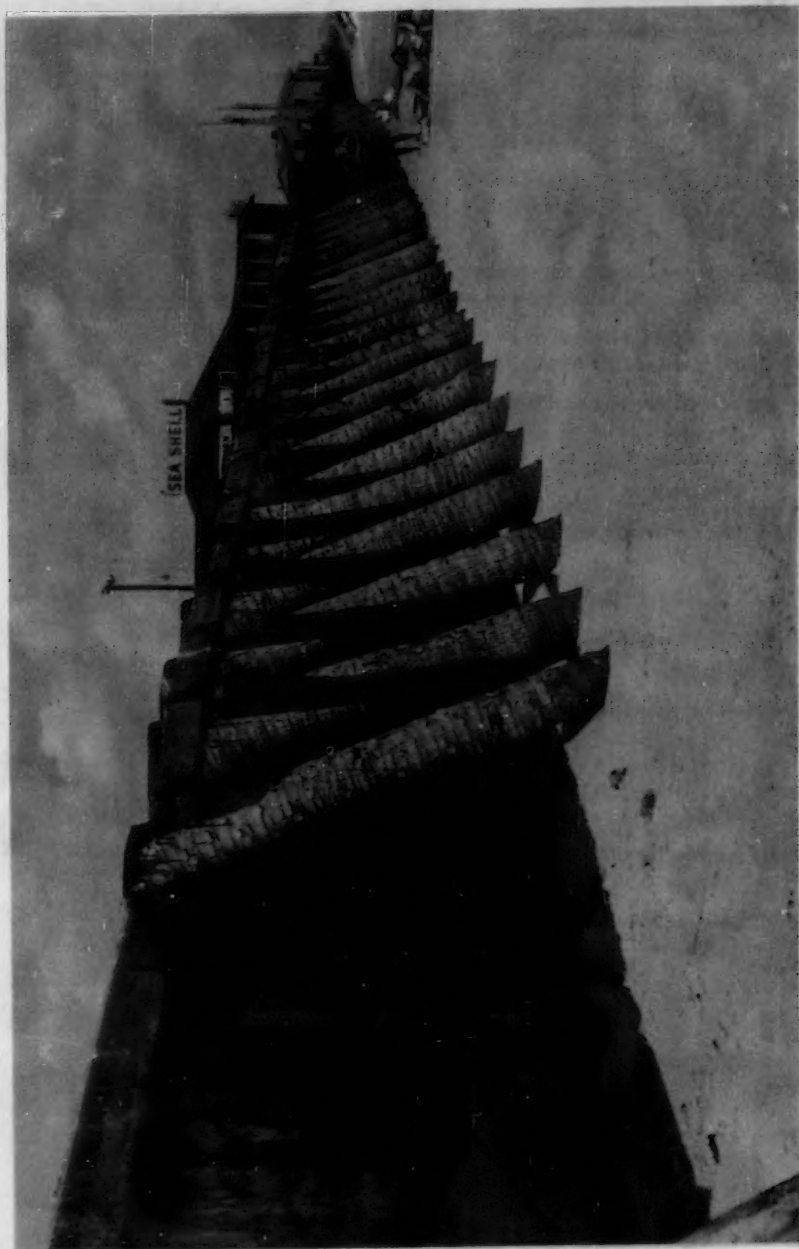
Scour in Front of a Vertical Wall which has to be Supported. Jacksonville Beach, Florida.
